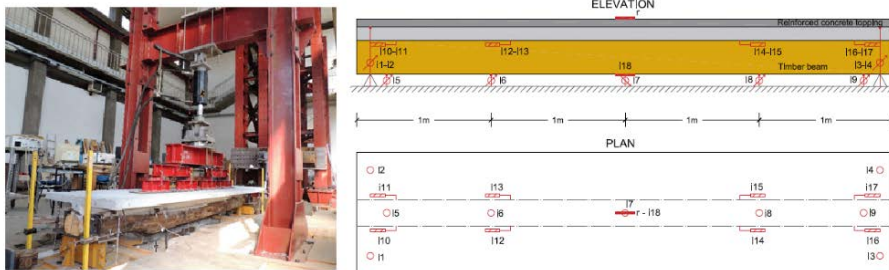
(a) Lab test; (b) Layout of test equipment.
